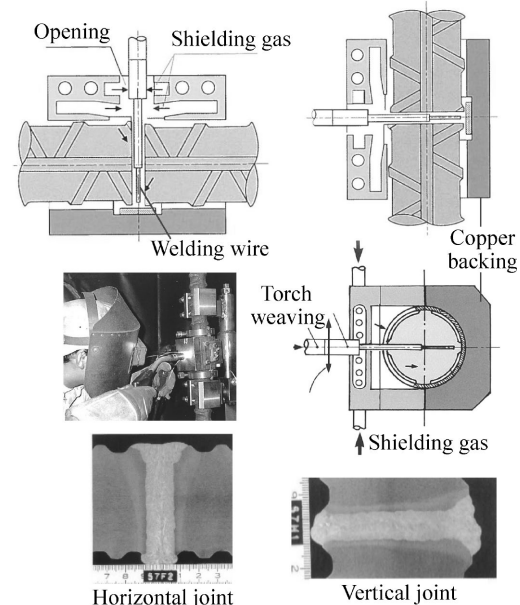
Reinforcing steel bar welding process "KEN-SH"
